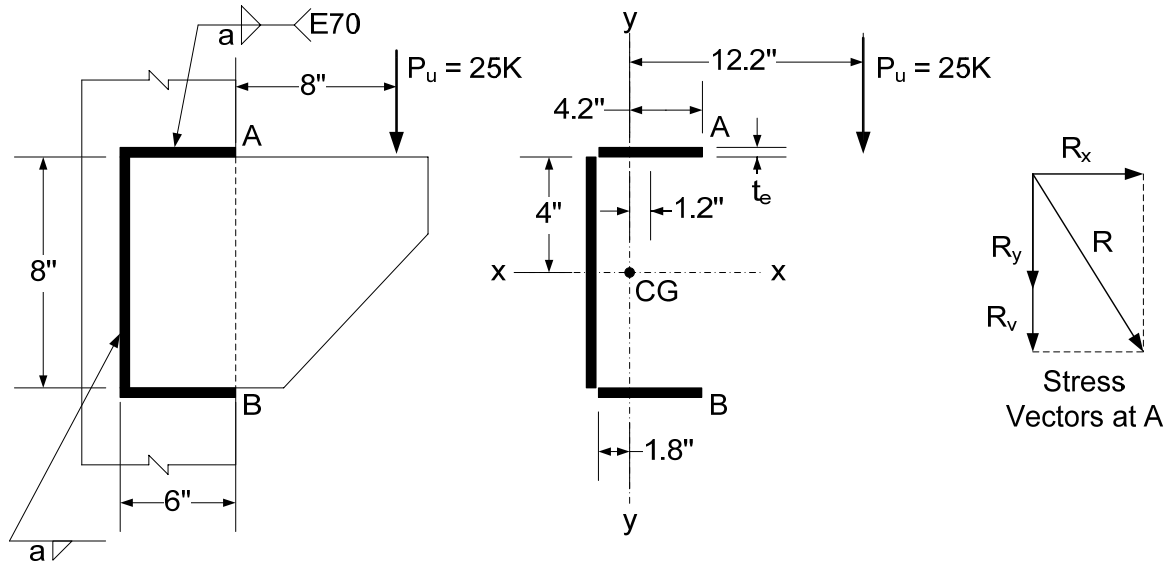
Eccentrically Loaded Fillet Welded Connection Subject to Combined Shear & Bending
